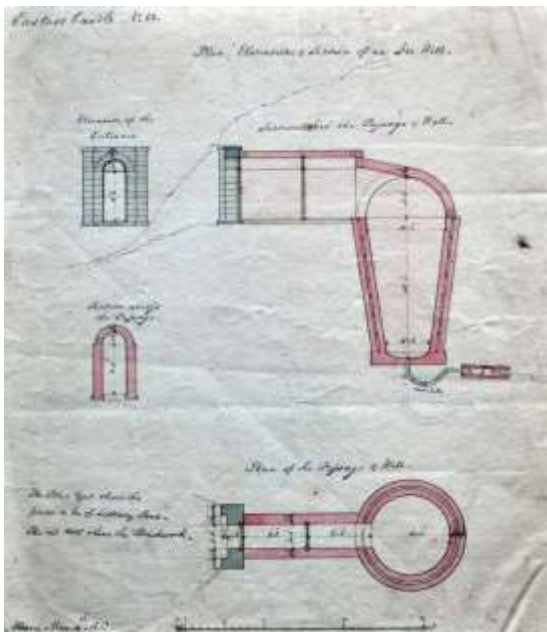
Plan 62 –‘Plan, Elevation and Section of an Ice House’ – dated 4 May 1813 (Eastnor Castle)
